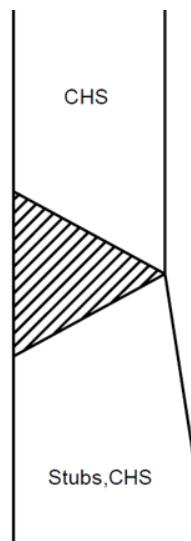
sketch of the weld between the CHS with different thickness
